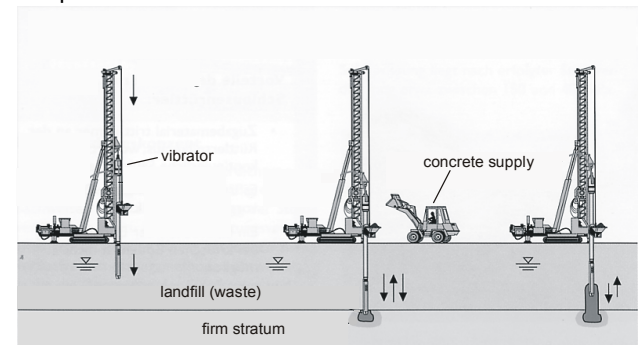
Steps to install vibro concrete columns (method of Keller Ground Engineering, Offenbach / Germany)
